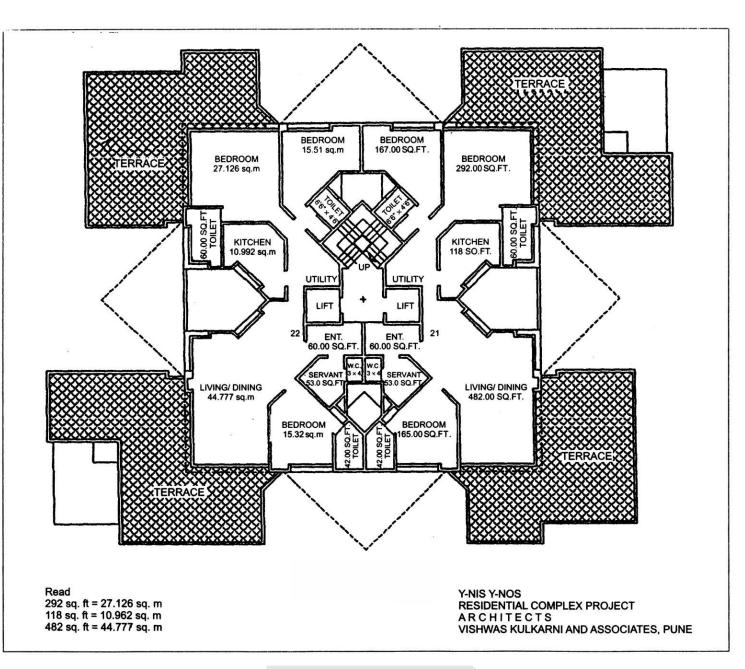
Y-NIS Y-NOS Fifth Floor Plan
